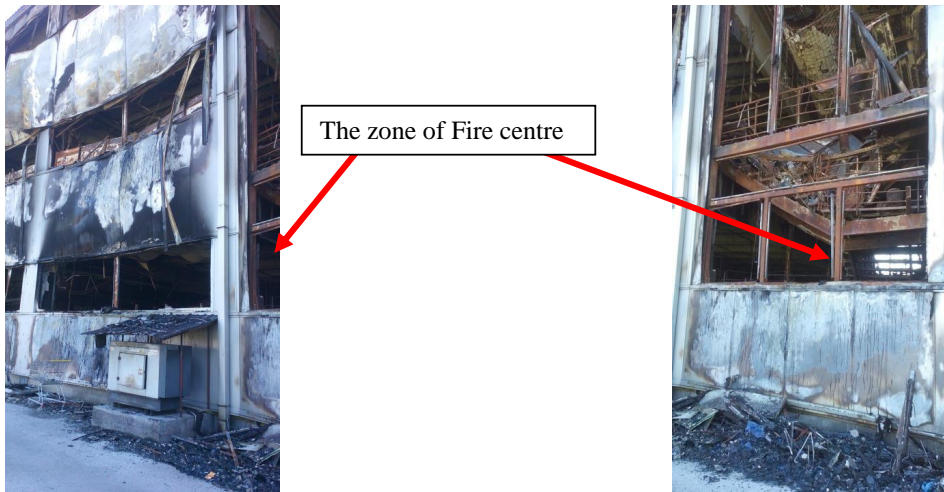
The zone of fire centre – observed from the outside, i.e. shopping mall facade
